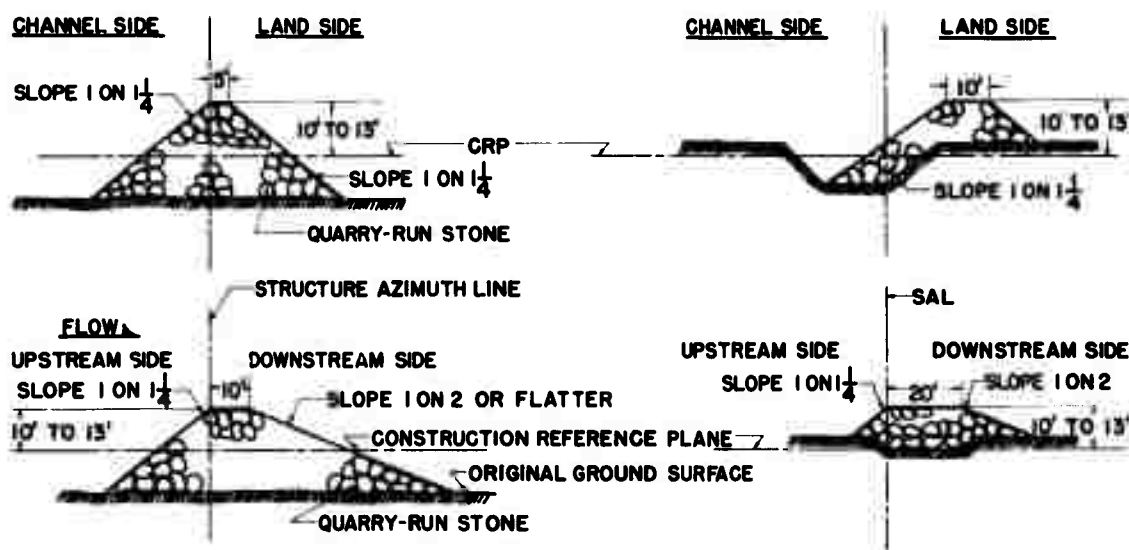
Typical sections of stone-fill dikes and revetments, Arkansas River bank stabilization
